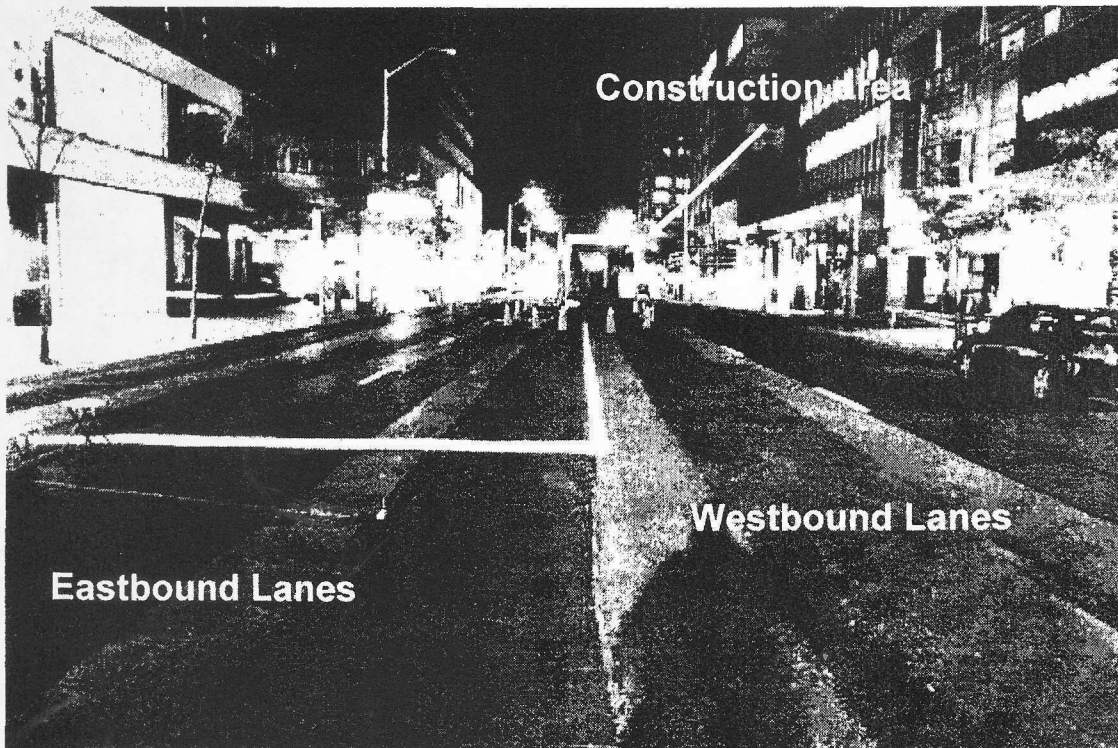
Westbound Bloor Street West approaching the construction (TSV00373.09 058)
